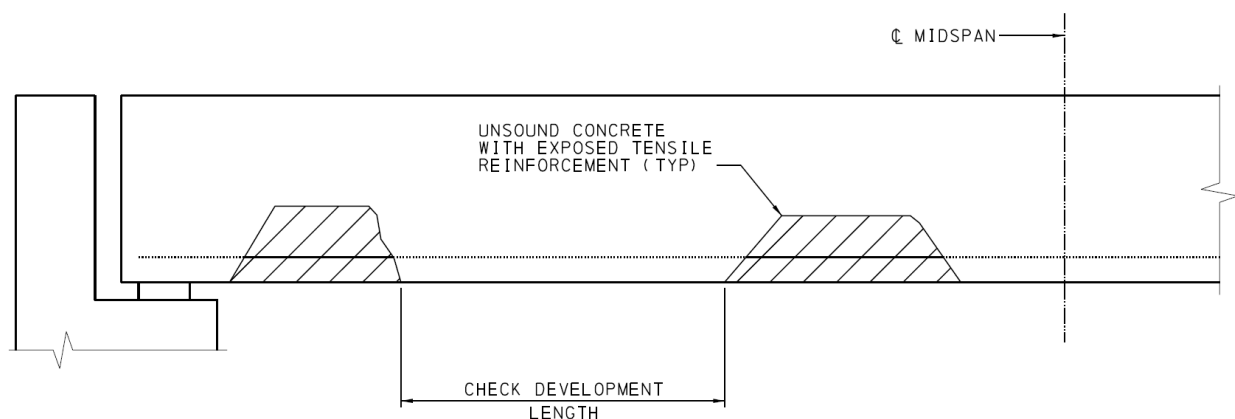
Debonding Length Schematic for Simple Beam
